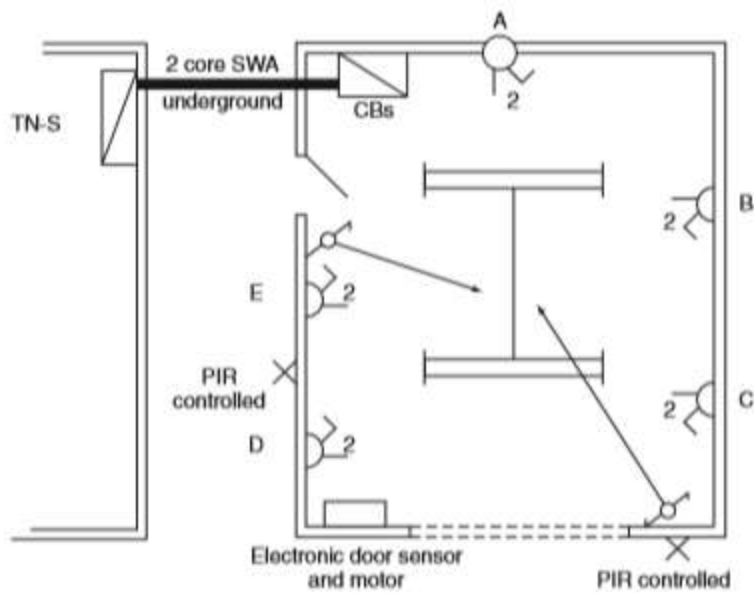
Shows the layout of the electrical installation in a new detached garage
